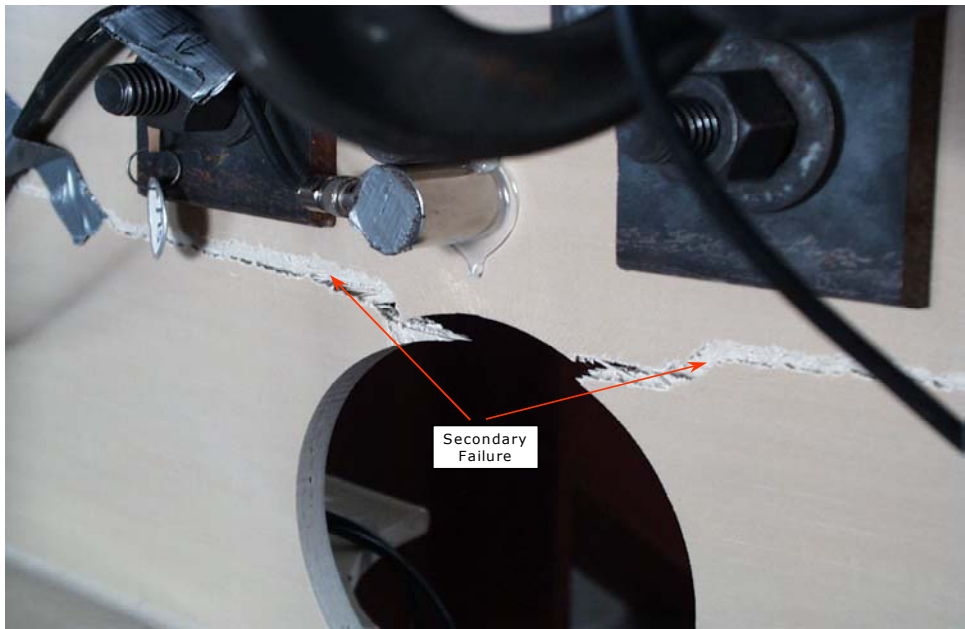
Specimen IKG2 Bottom View of Failure.
